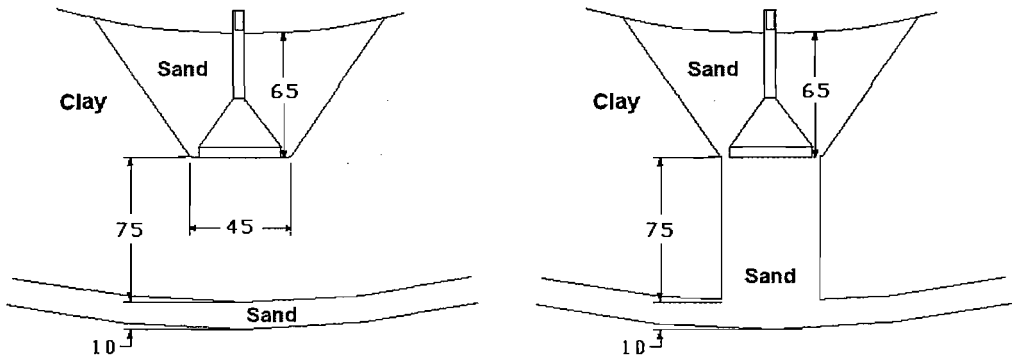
Test geometries of plate anchor series 3 – cemented backfill
